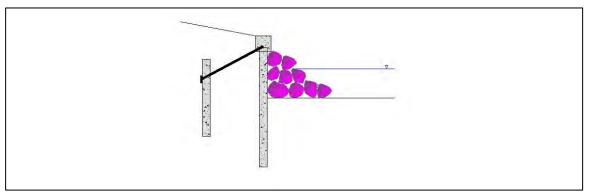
Broken concrete or rubble rip rap (pink) placed in front of the existing seawall (grey) to add stability and dissipate wave energy.
